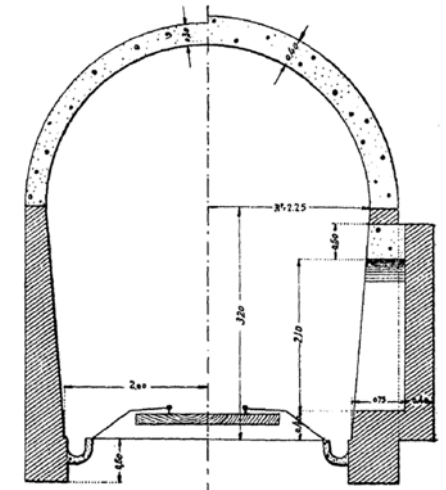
Cross-section of tunnels (Mendizábal, 1926)
